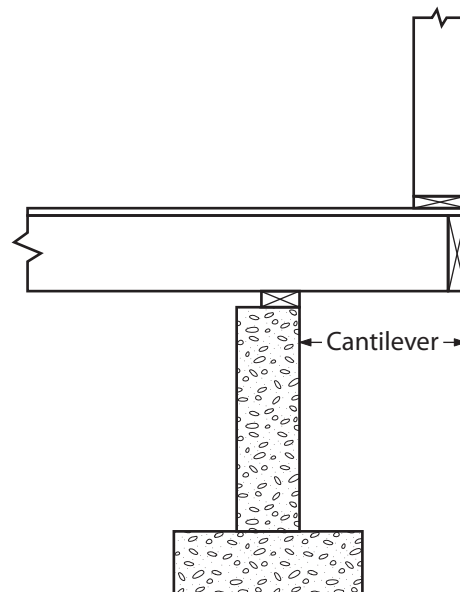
Cantilevered floor joist resting on a concrete foundation
